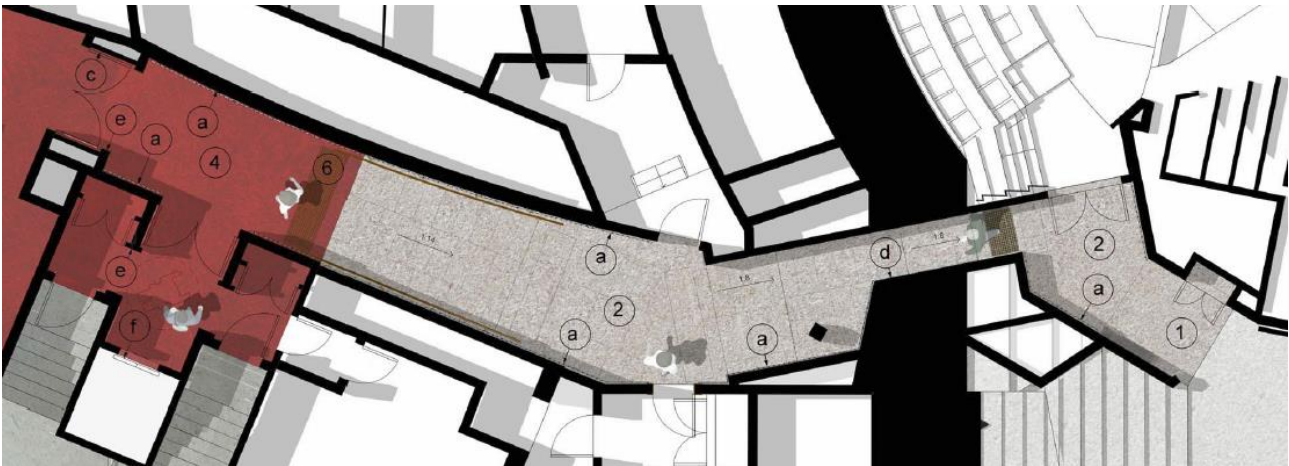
Extract from plan indicating Level 2 passage connection to Northern Foyer (49-VA-SC021\_DA130\_A)
